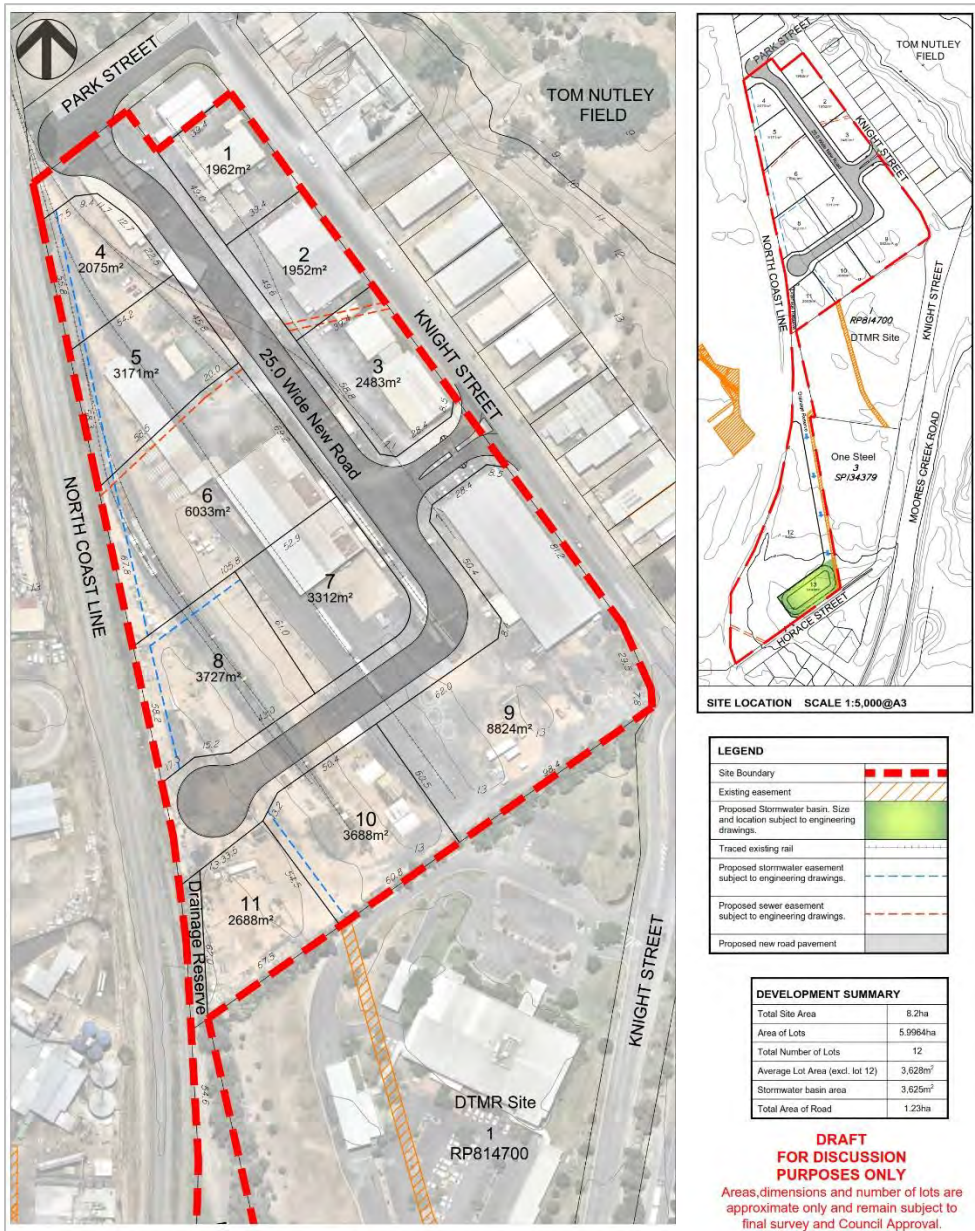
Proposed Subdivision Layout (North) [Source: Veris Australia Pty Ltd]
